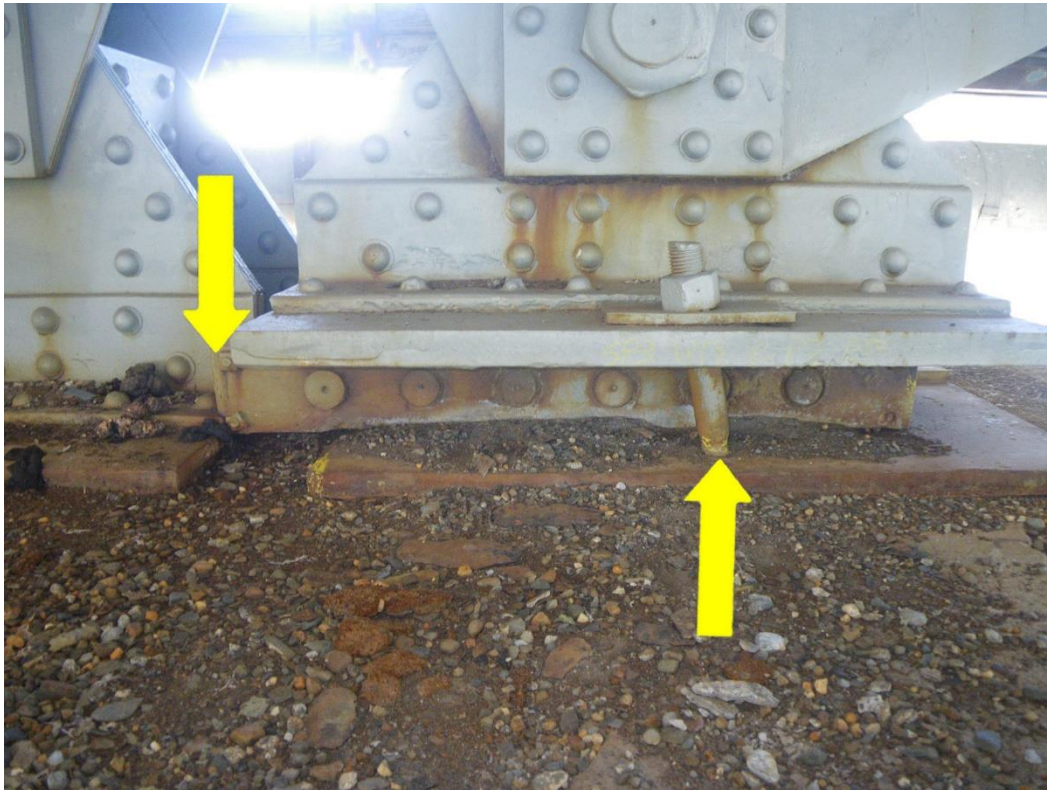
West Truss Bearing at Pier 3, East Face, Span 3 - Nested roller assembly expanded beyond the masonry plate edge and in contact with adjacent fixed bearing. Note anchor bolt severely bent with section loss.
